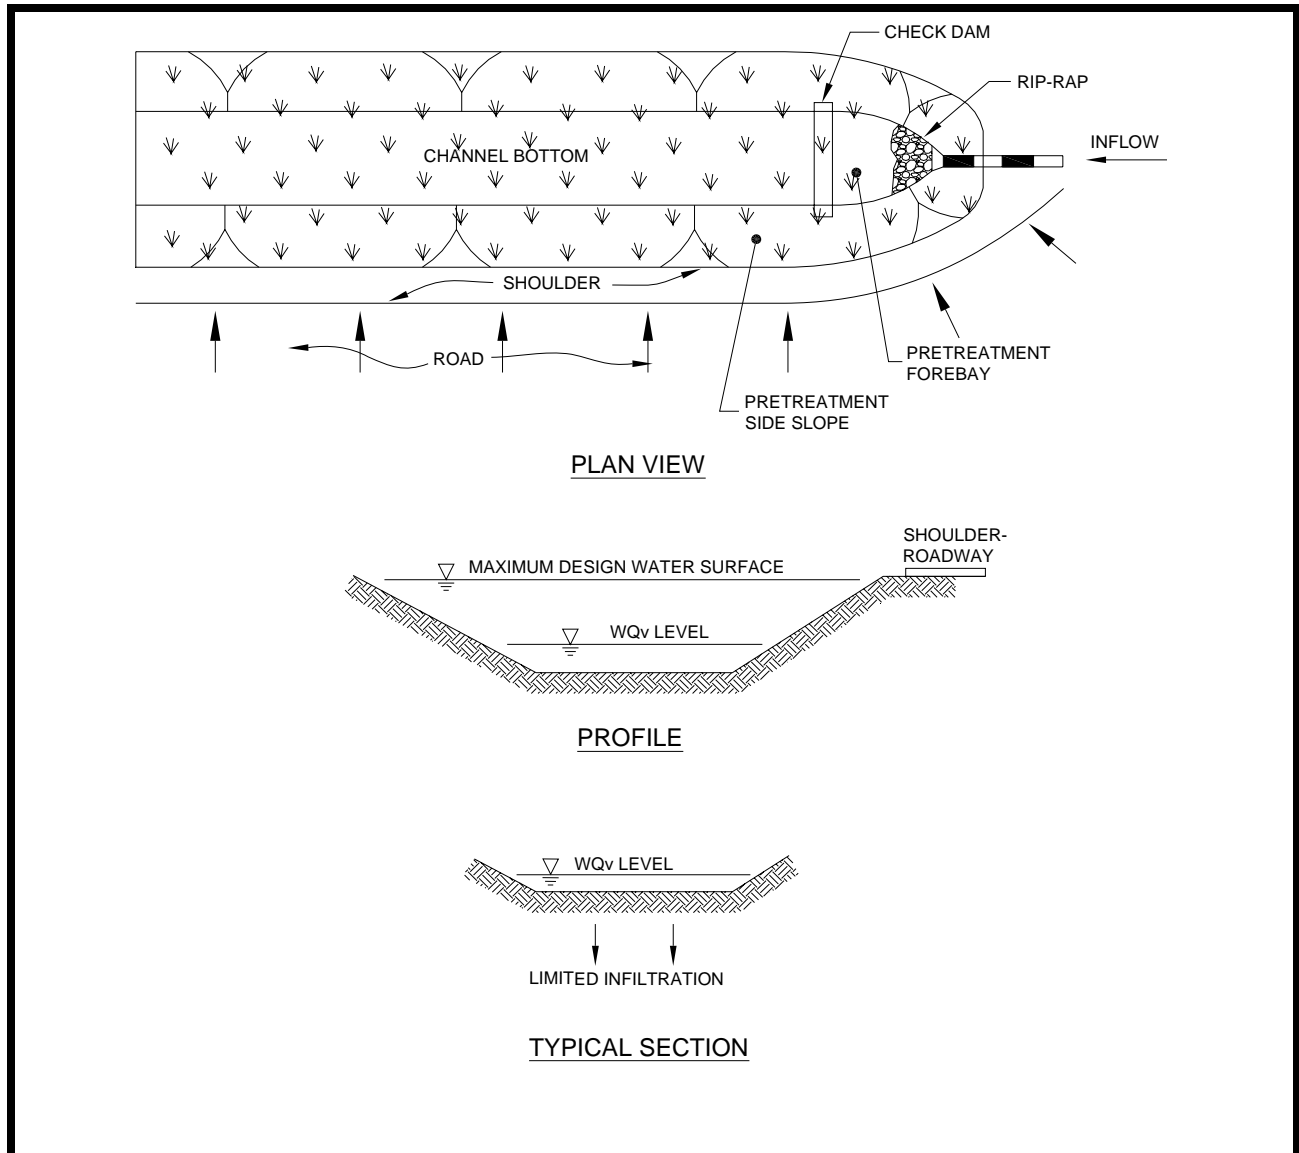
Typical Grass Channel (Plan and Profile Views)
